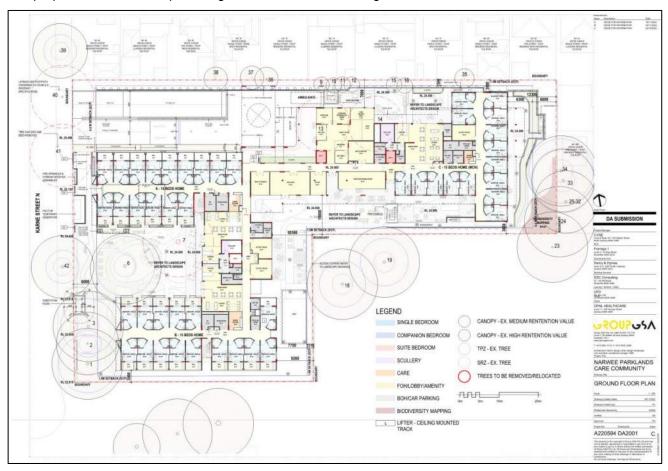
Proposed Architectural Plan (Ground Floor) - Group GSA
